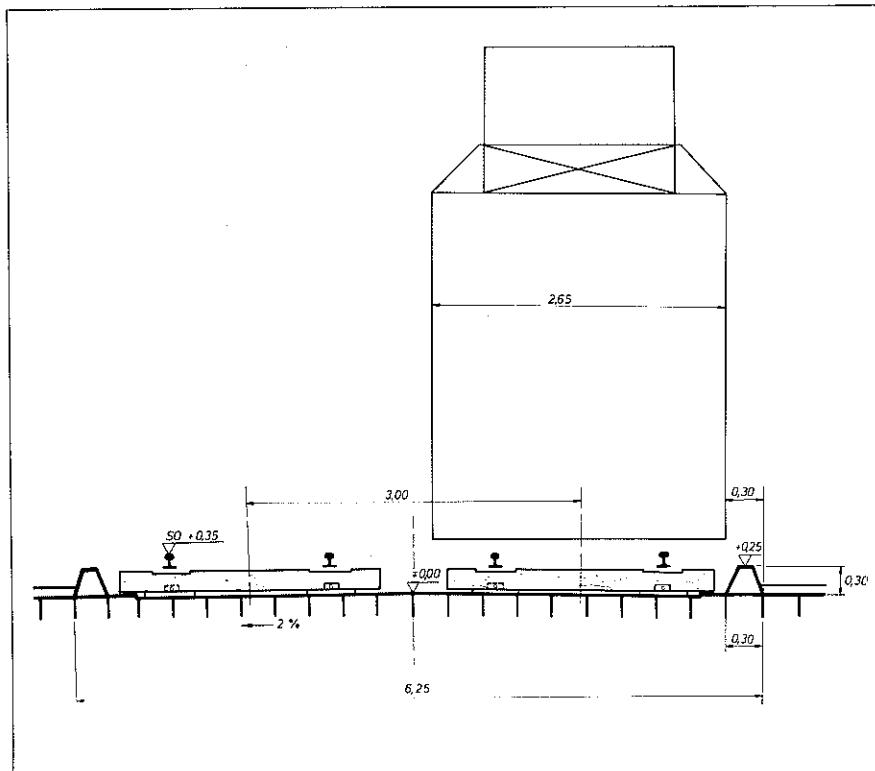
Light rail cross-section on the Mülheimer Brücke
